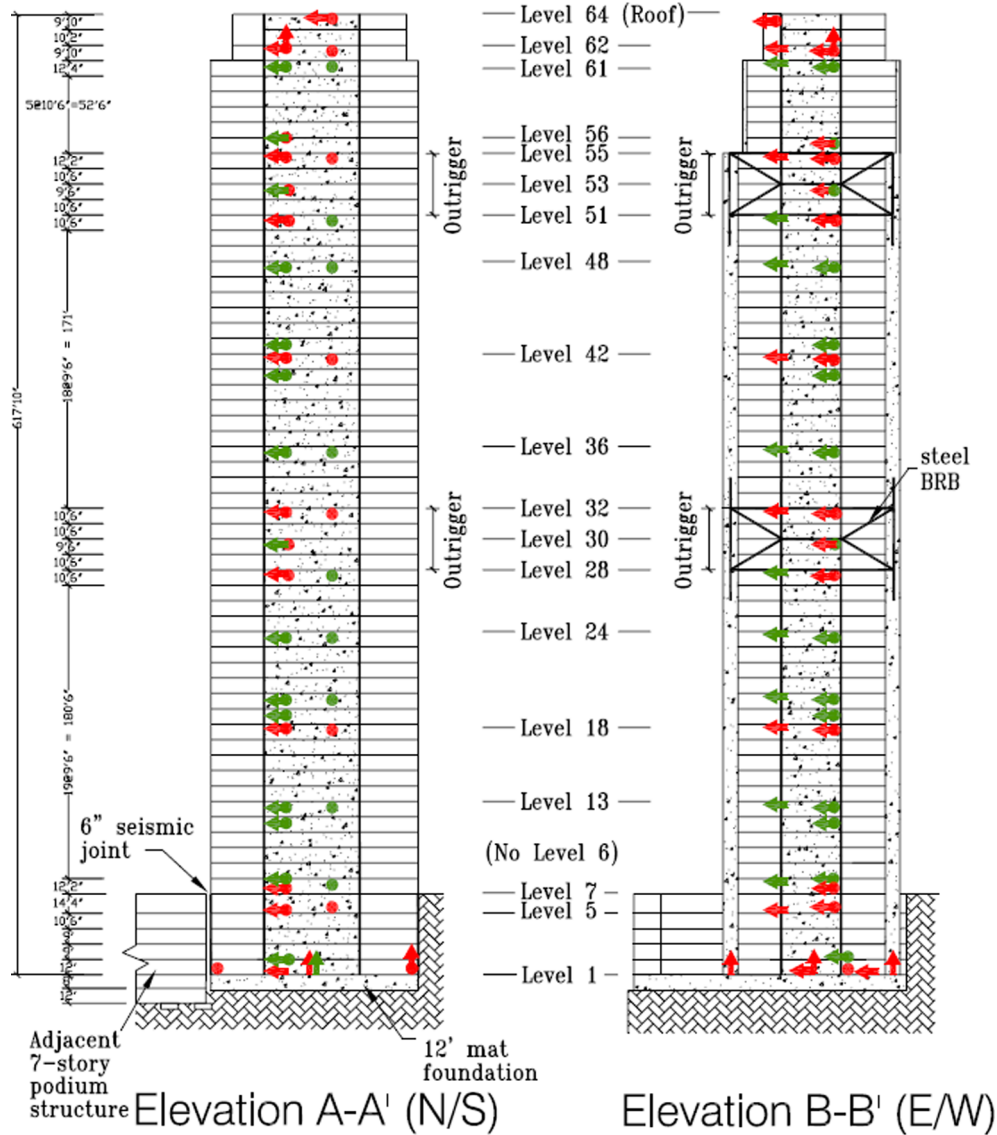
Elevation view of One Rincon Tower and sensor locations [37].
